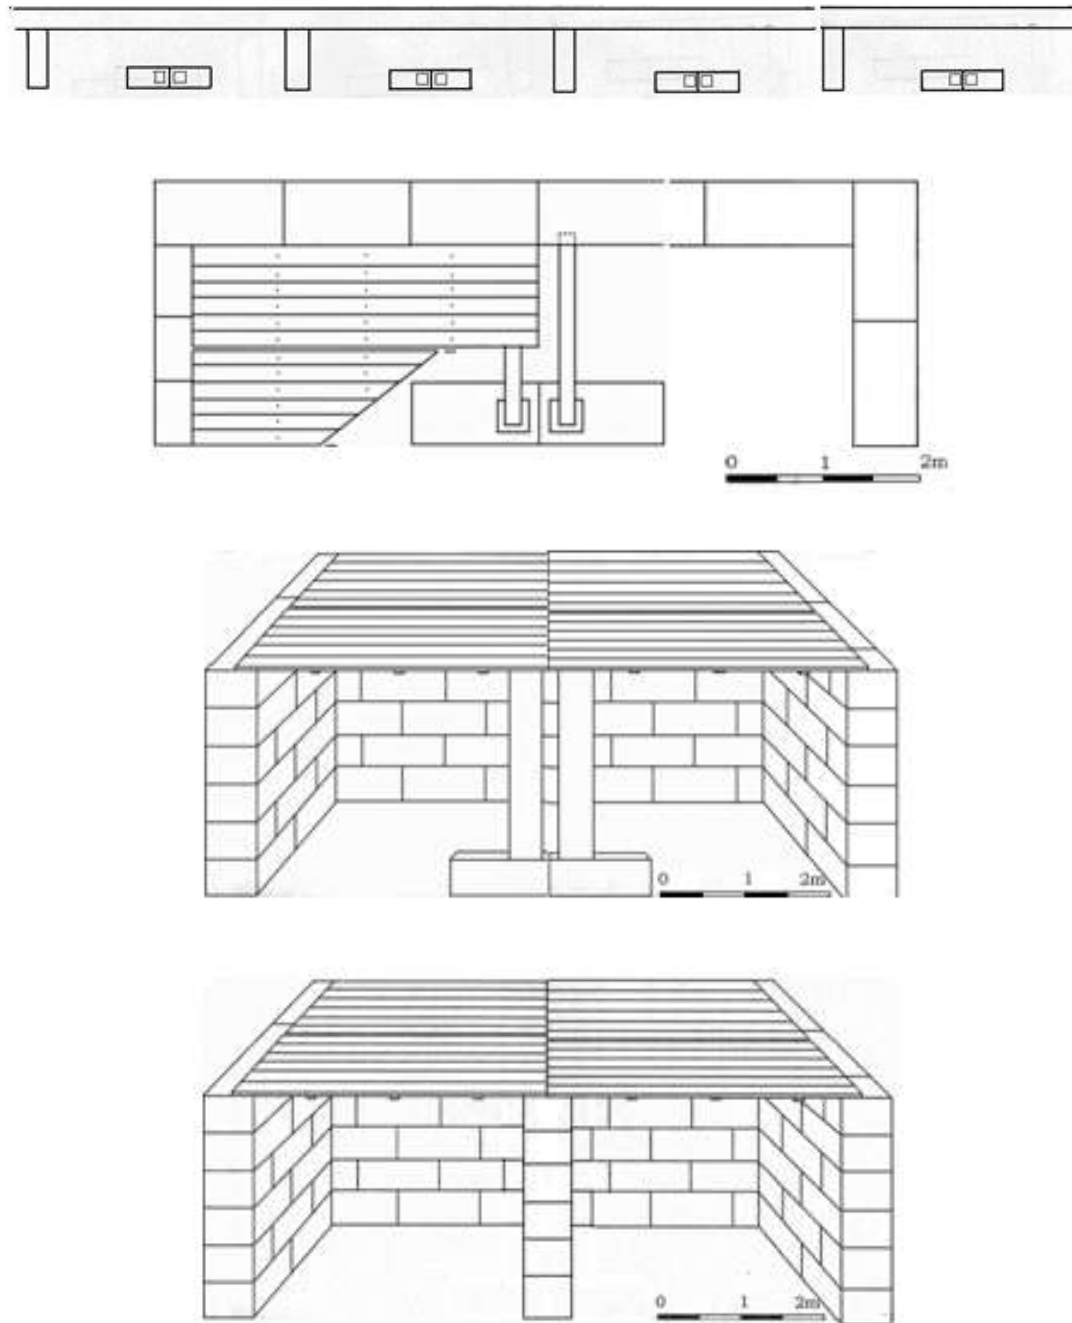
Reconstruction of the east and southeast wall, *bottom*, at Halai with a removable wallwalk of wood
